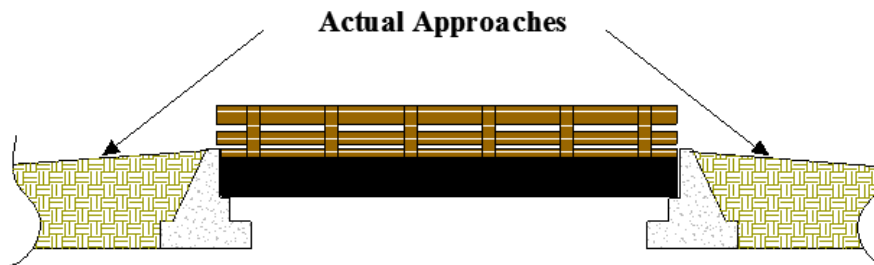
Elevation View of the Route 601 Bridge with Sloped Approach Slabs Due to Soil Settlement (Restrepo, 2002)
